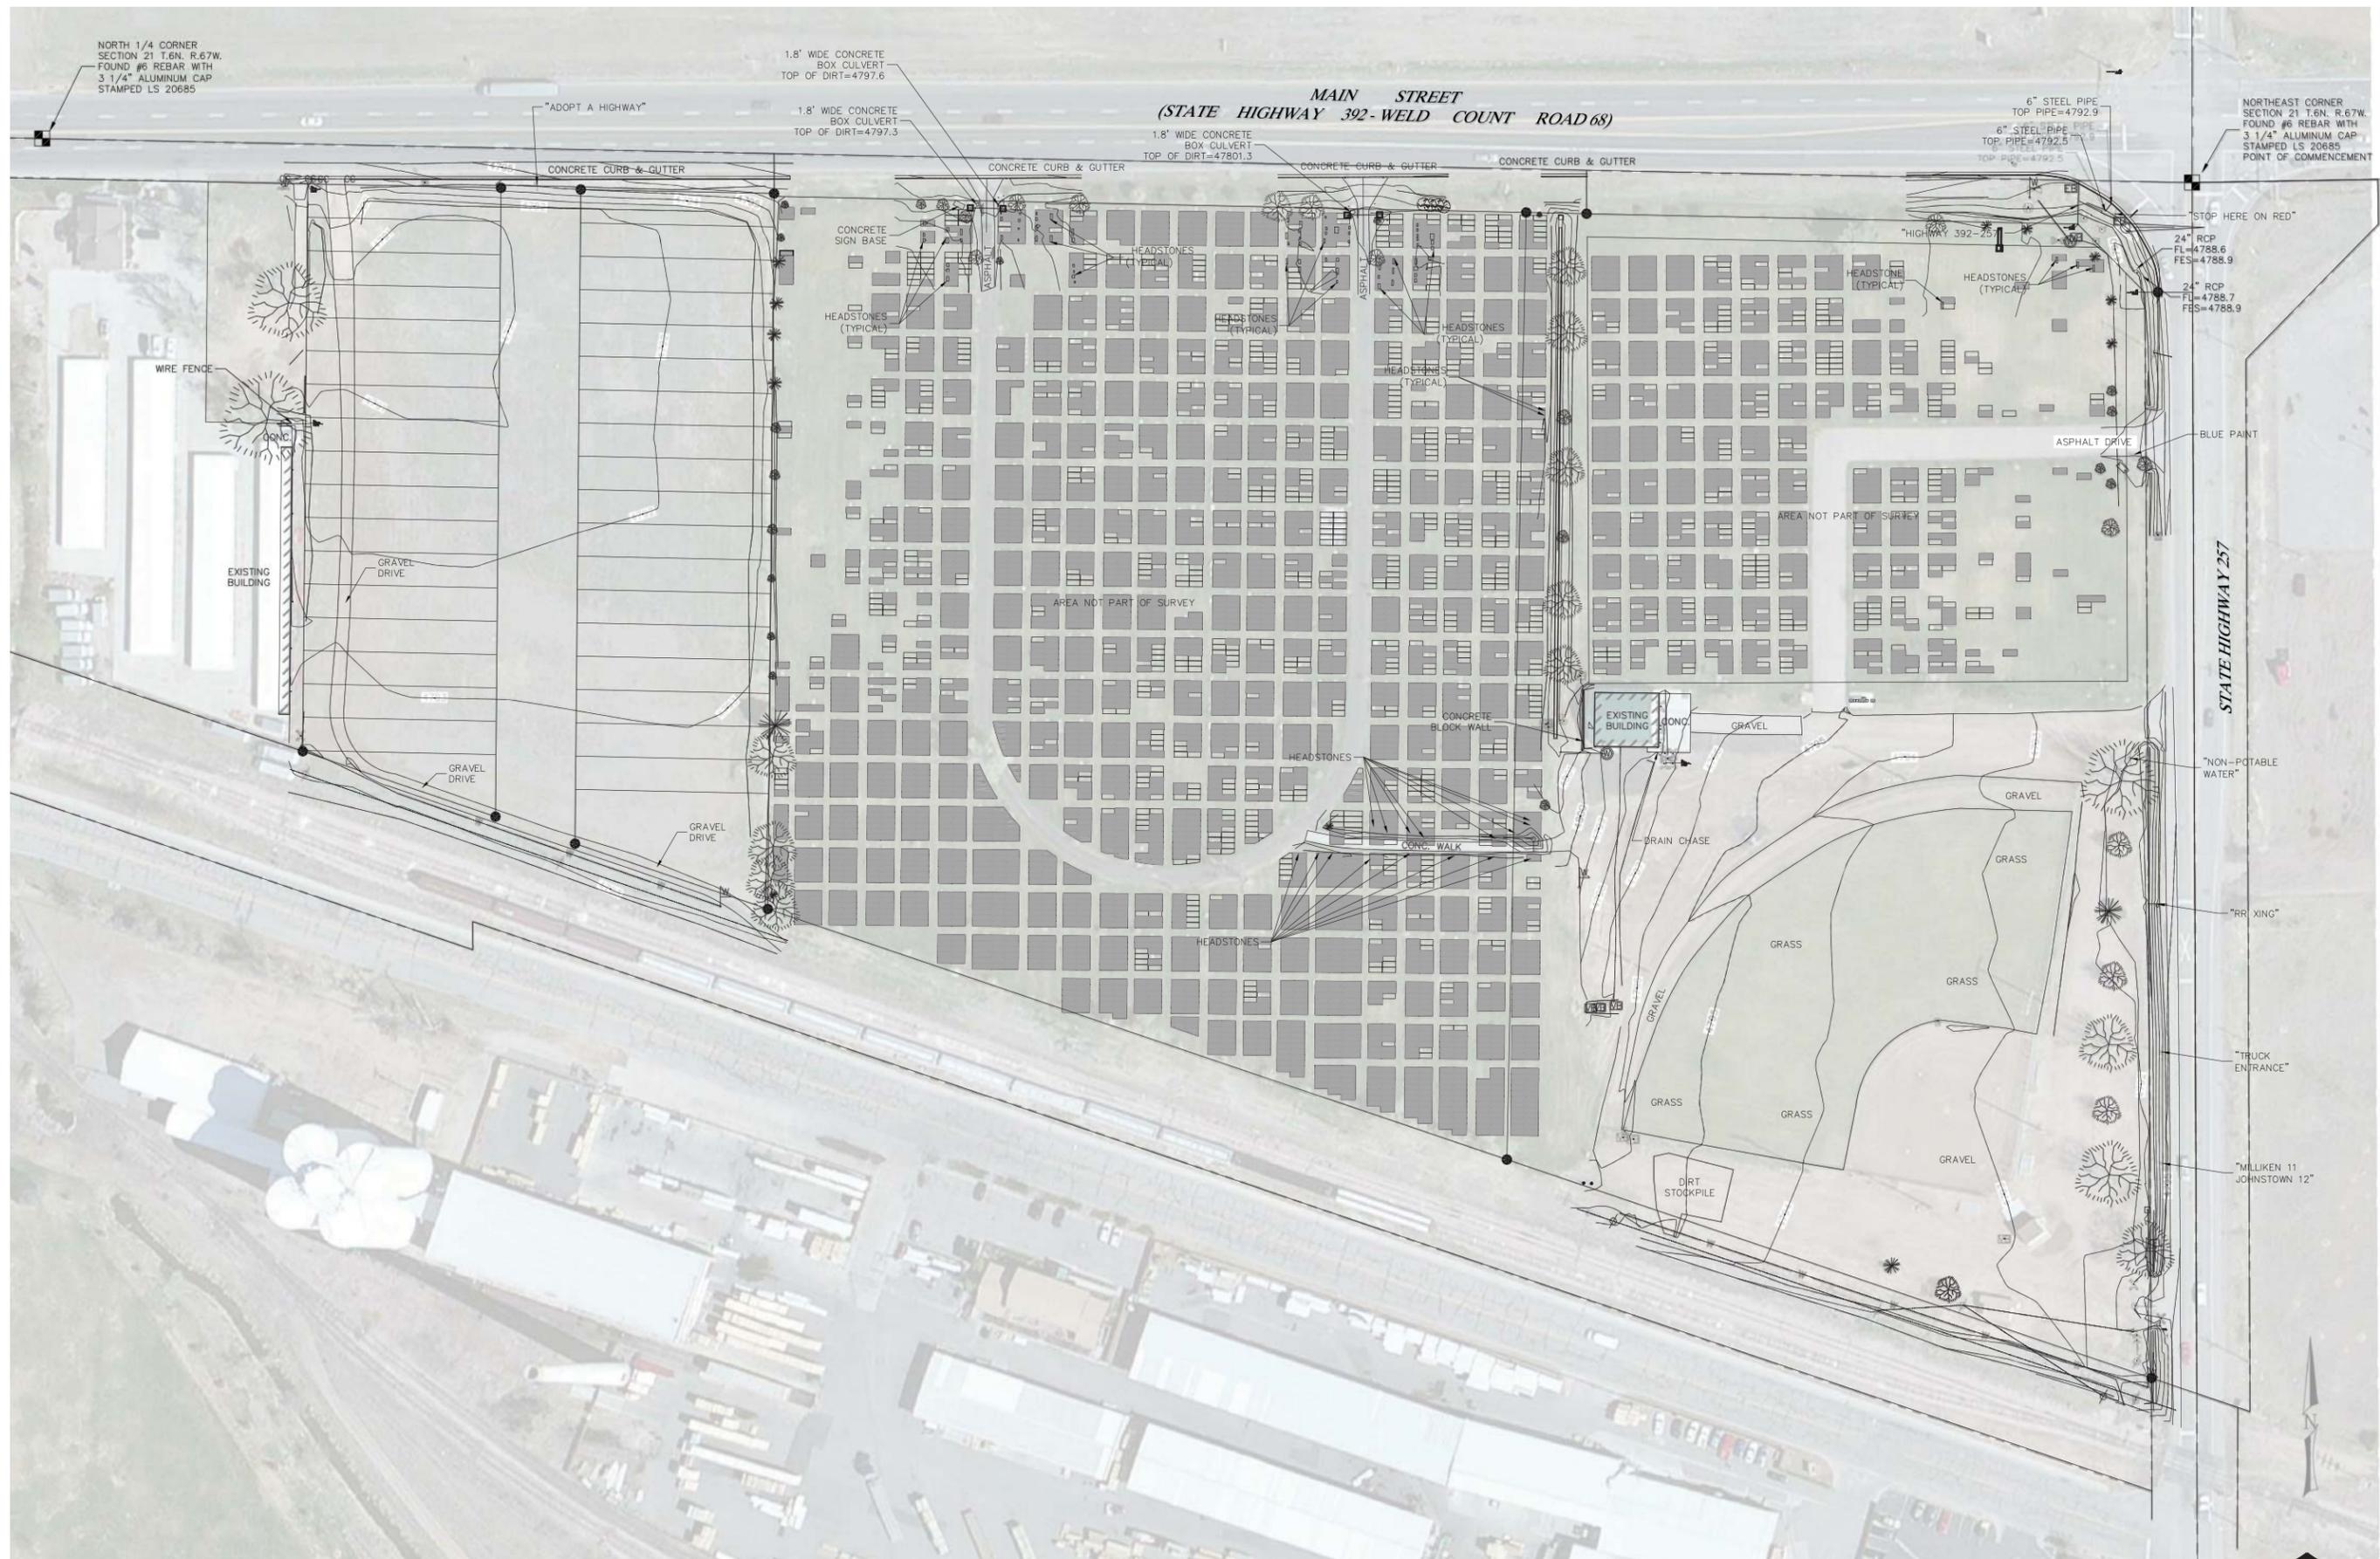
Site Aerial and Survey provided by the Town of Windsor, July 2013 from King Surveyors. A GIS plot plan provided by TOW is overlaid on the survey.
